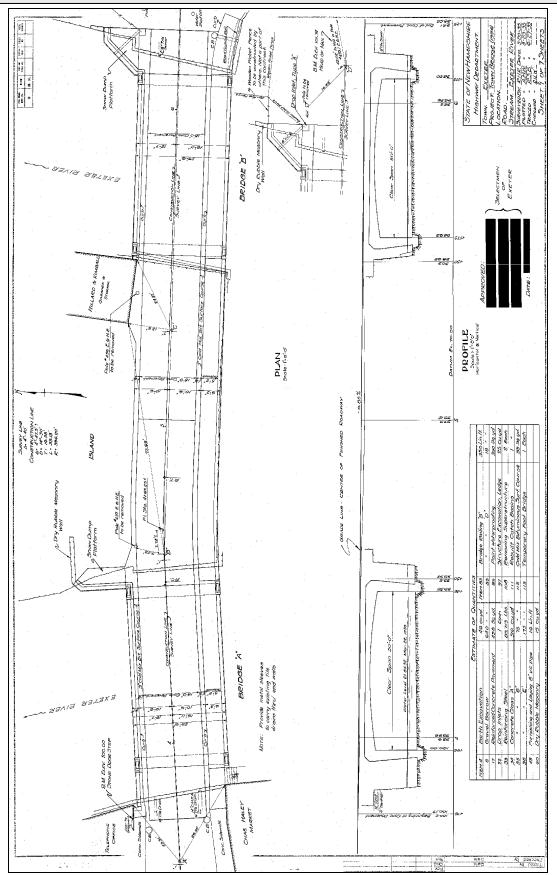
Original bridge plan, Sheet 1 of 7, 1935, showing plan and elevation of two structurally identical 50'-span Concrete Rigid Frame bridges separated by 130' solid fill island (NHDOT Bridge Plan File No. T-16).
